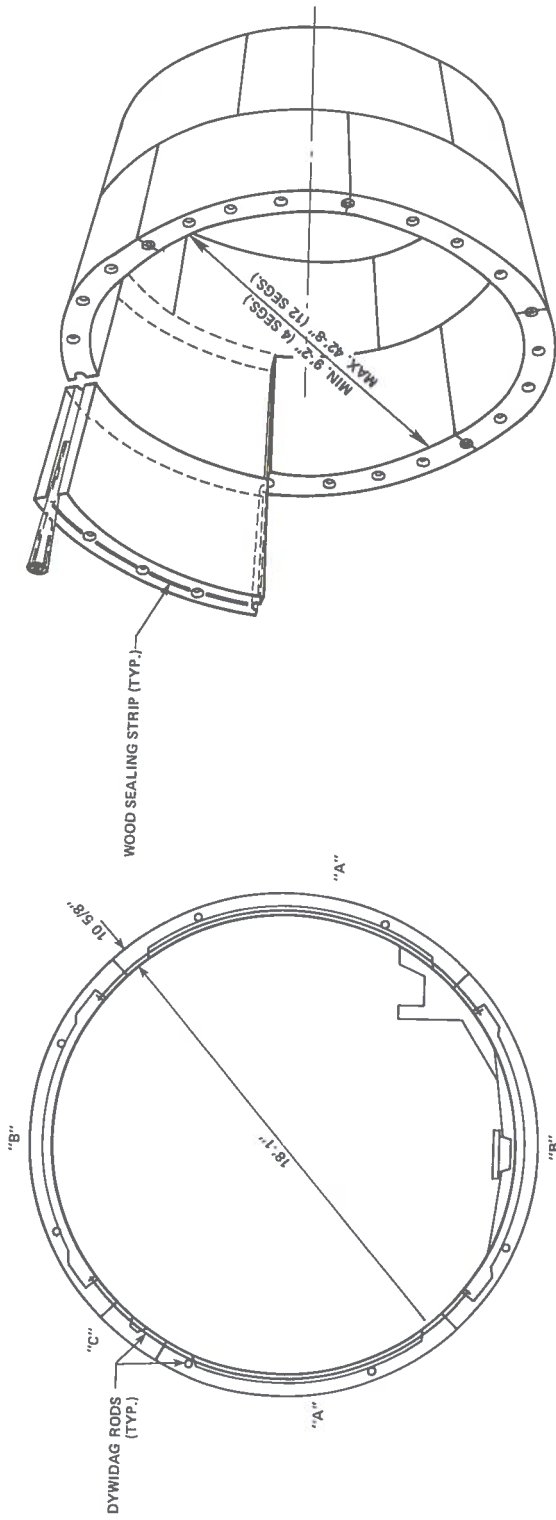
Existing Tunnel Lining Systems - Sheet 1
